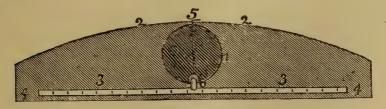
shows section with interior end of drum, 1; 2,2, crown; 3, 3, iron perforated pipe; 4, 4, bottom level; 5, valve-rod to open and shut valve to pipe (6).
